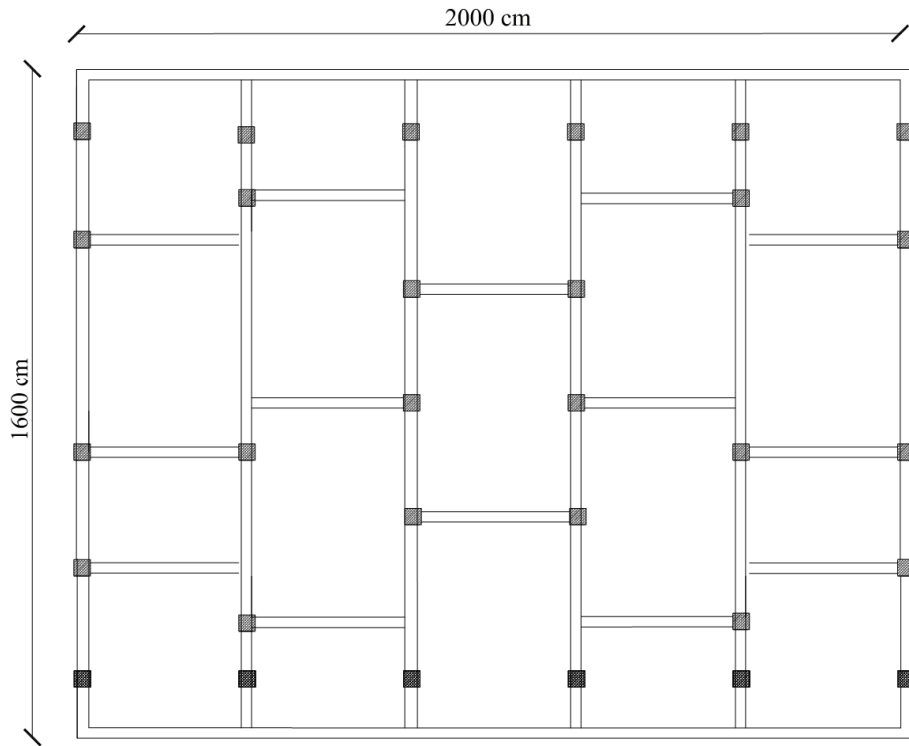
Floor plan of structure E ($T=0.72$ sec, $GDF=0.84$)
